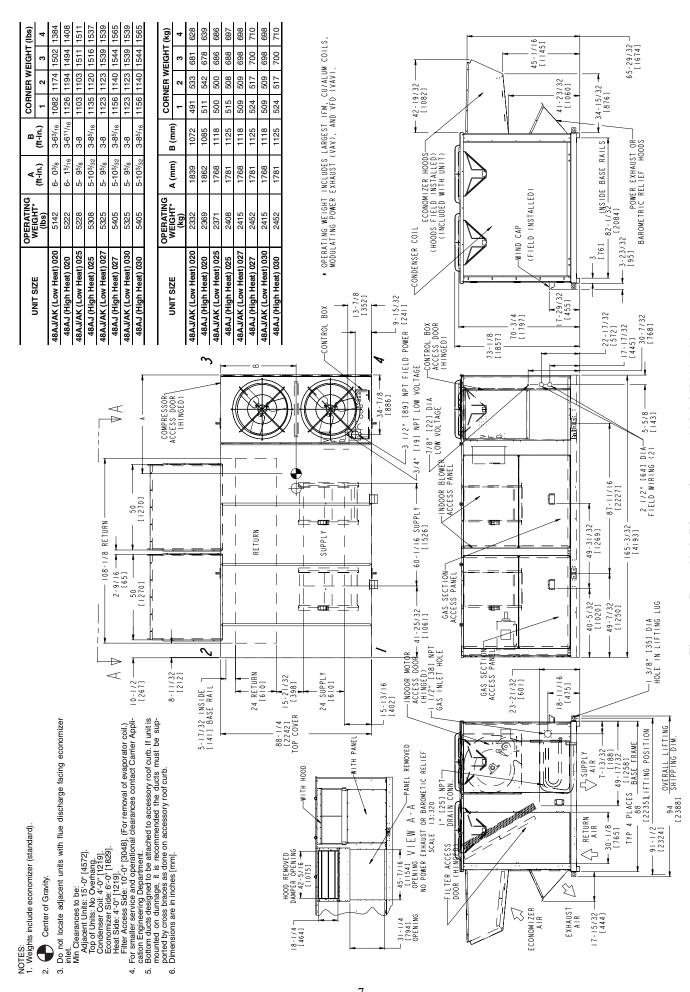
Base Unit Dimensions — 48AJ, AK020-030
